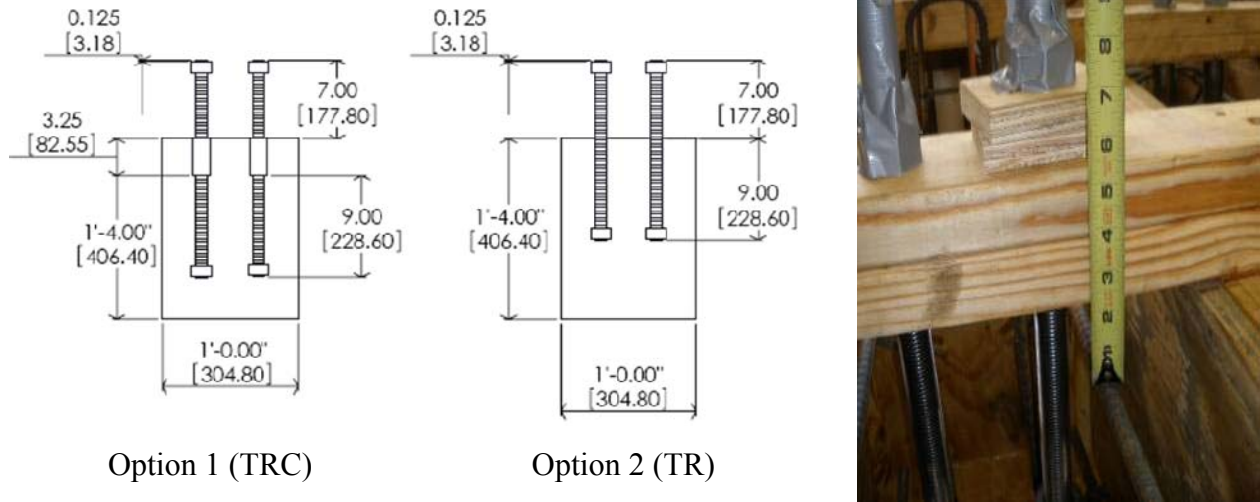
CIP Details of Beam-to-Slab Shear Connections.
